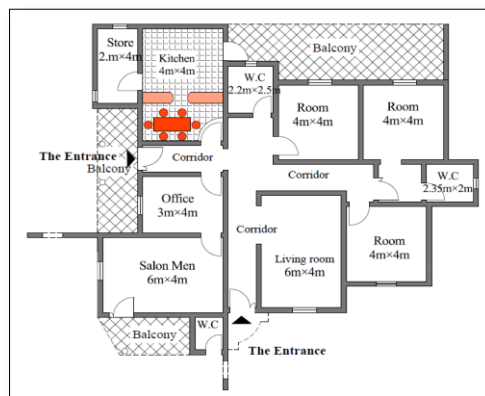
The plan of Abdalmast Shahrani house in Tripoli.
